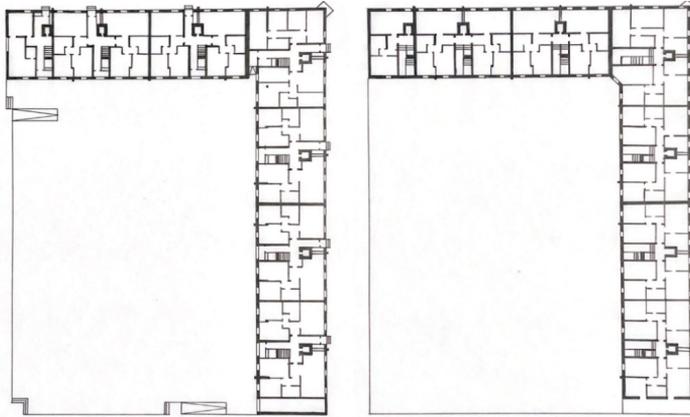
Author's schematic re-drawings of 1st & 2nd-floor plans of Álvaro Siza's project in Giudecca, 2024.
